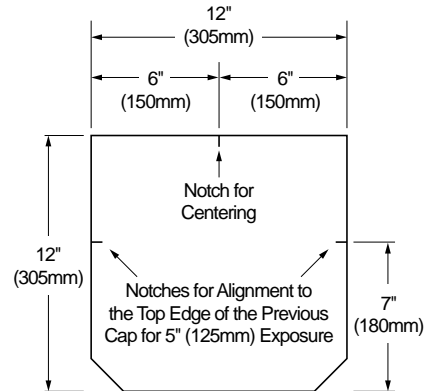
Each accessory shingle has a centering notch and two side-alignment notches to help ensure proper placement.
